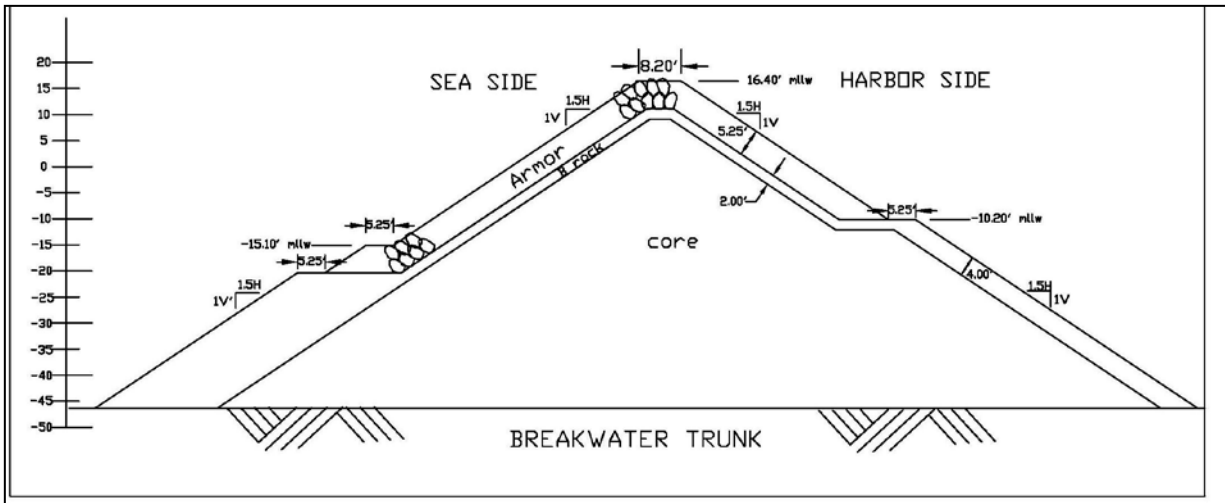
Breakwater Trunk Cross Section for Alternatives 1, 4, and 14.
